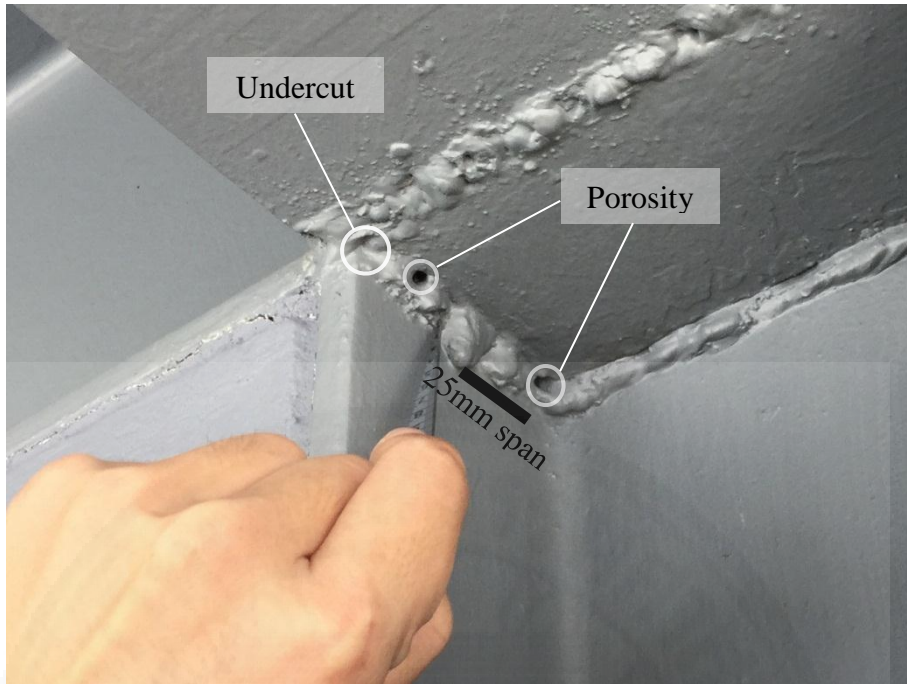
Welding defects on Steel Structure A (joint 5)
